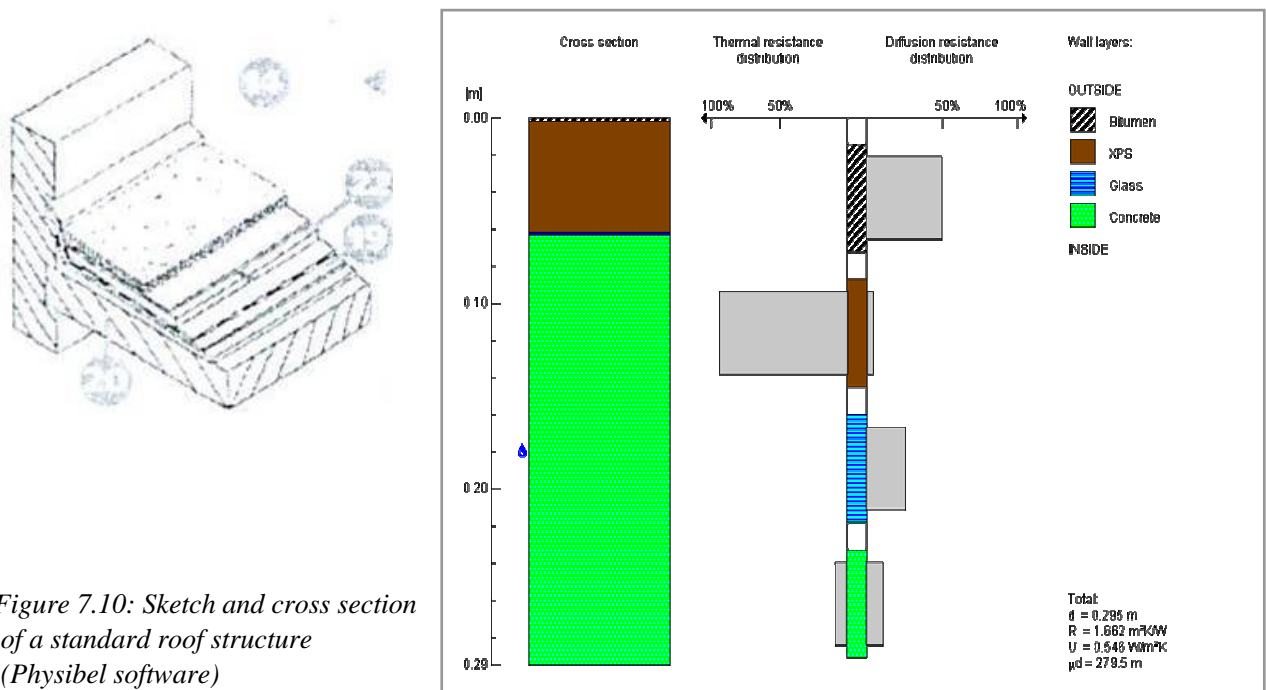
Sketch and cross section of a standard roof structure (Physibel software)
